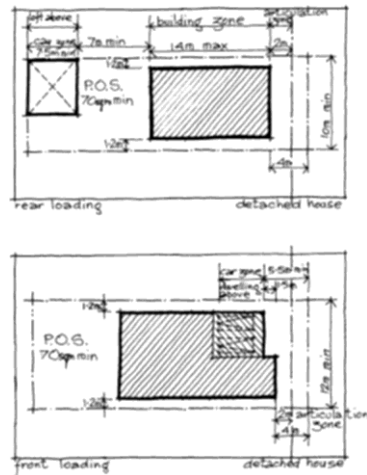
Subdivision and allotment planning control diagram – Front loading and rear loading.
